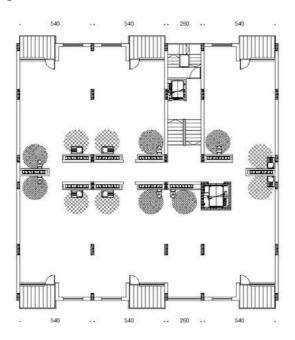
Basic elements of the structural system of a composition, and arrangement of all ventilation and sanitary verticals, as well as the arrangement of apertures and loggias on the facade walls
